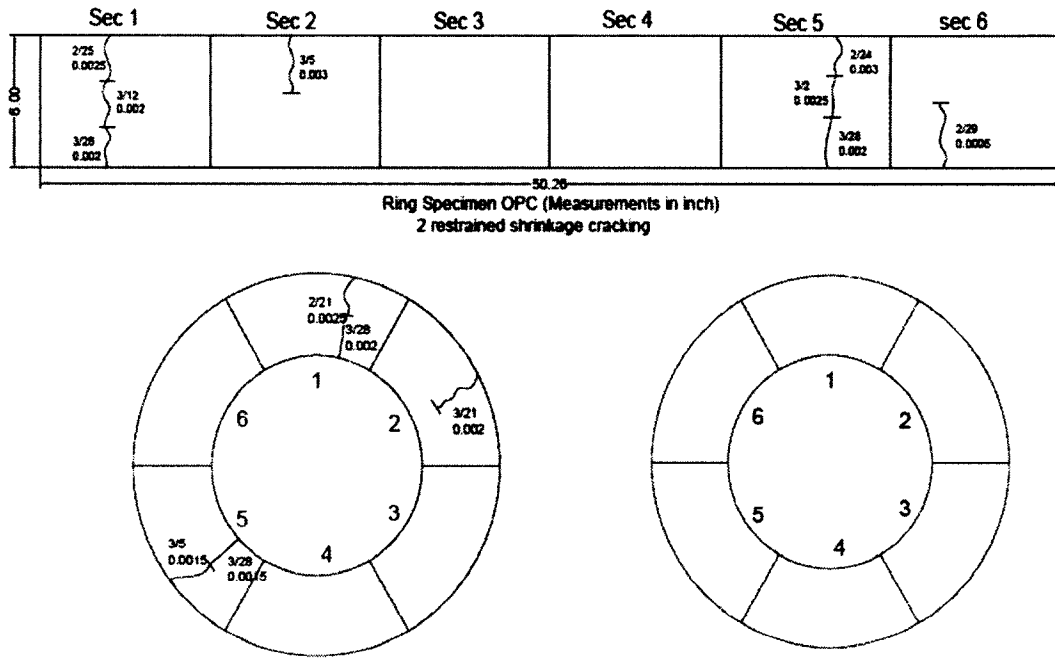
Crack map of side, top and bottom view of OPC 8000 ring.
